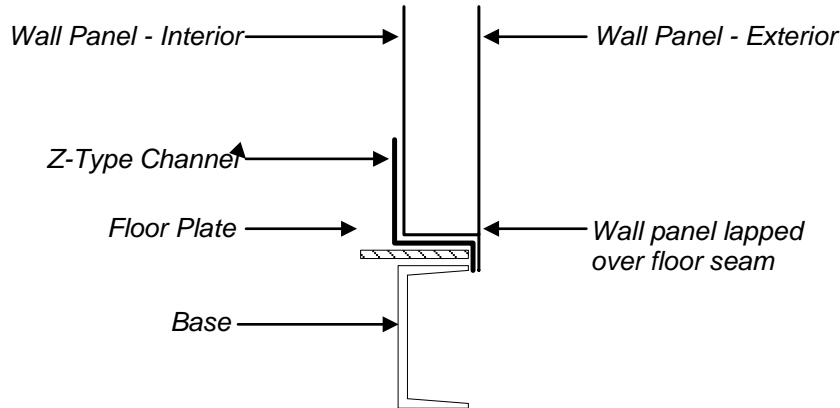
Cross Section Wall-Panel Base Z-Type Channel
